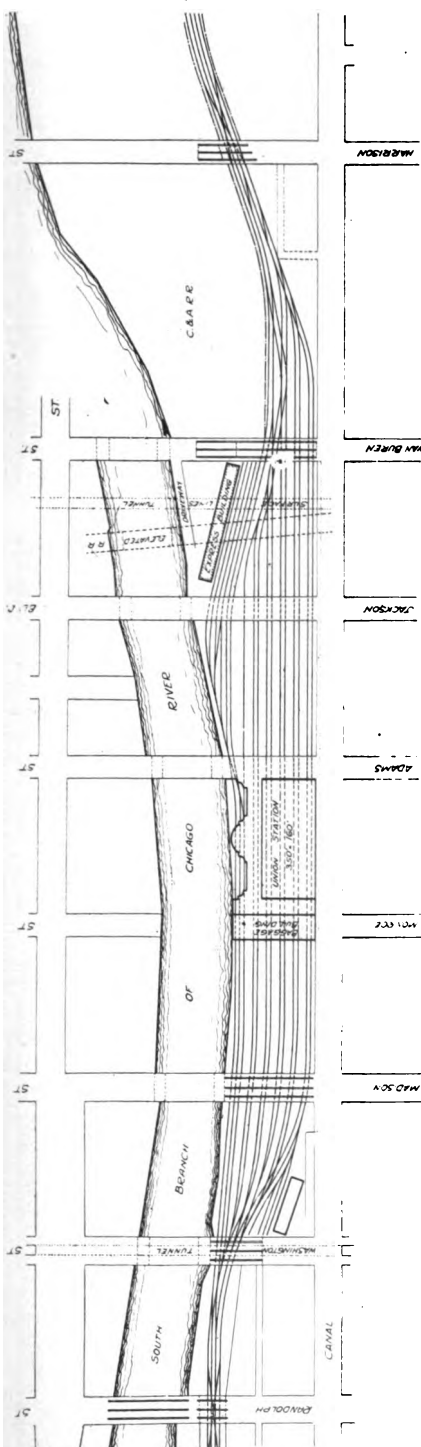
THIS PLAN PROPOSED IN 1906 WAS FINALLY ADOPTED WITH MODIFICATIONS.
